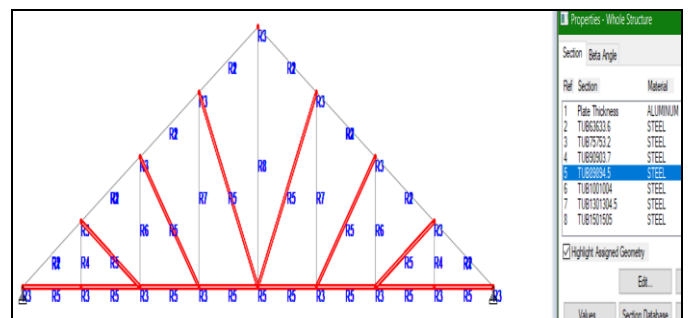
Property of Steel TUB 89 X 89 X 4.5 mm provided for above red colored Member of Steel Truss.
